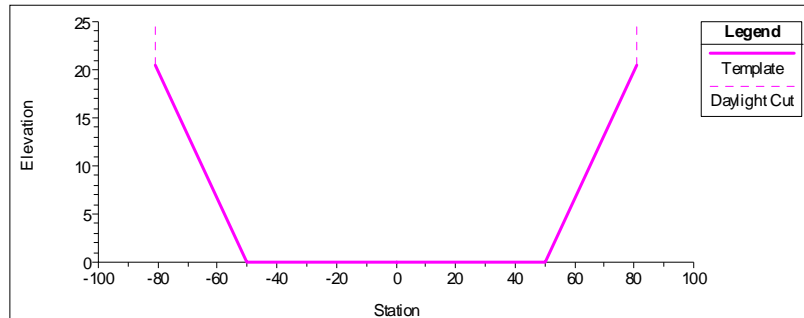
TYPICAL CROSS SECTION OF SCENARIO 3 IMPROVEMENT (ELEVATIONS IN NAVD)
